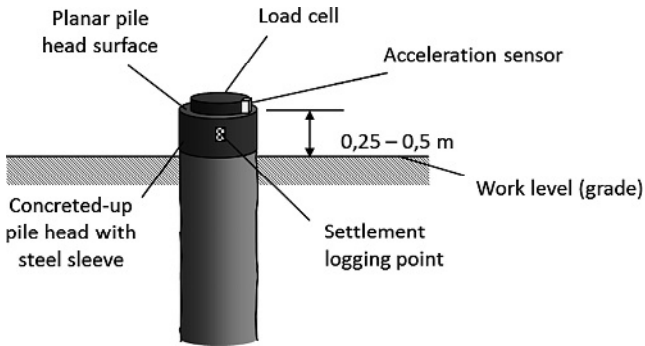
Schematic of measuring configuration and preparation of a cast-in-place concrete pile for rapid load testing
